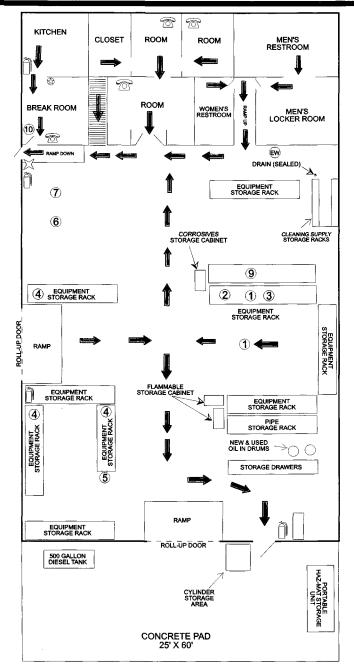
SITE PLAN EMERGENCY EVACUATION STAGING AREA
